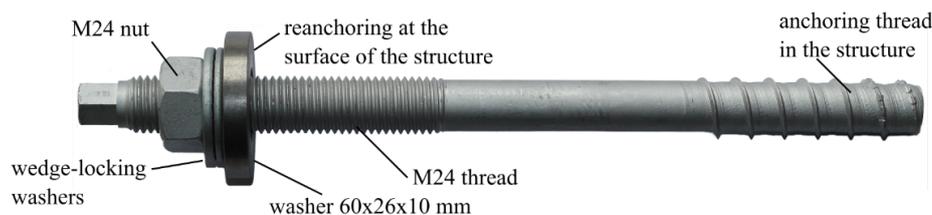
Concrete Screw Anchor with anchoring thread which creates a form-locked connection and the re-anchoring at the concrete surface of the structure.
